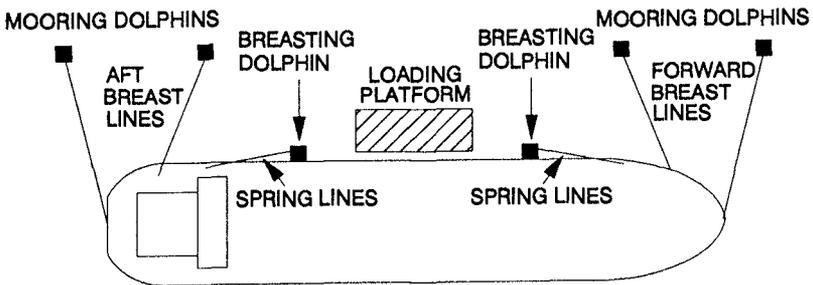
TYPICAL BERTH LAY-OUT FOR TANKERS
